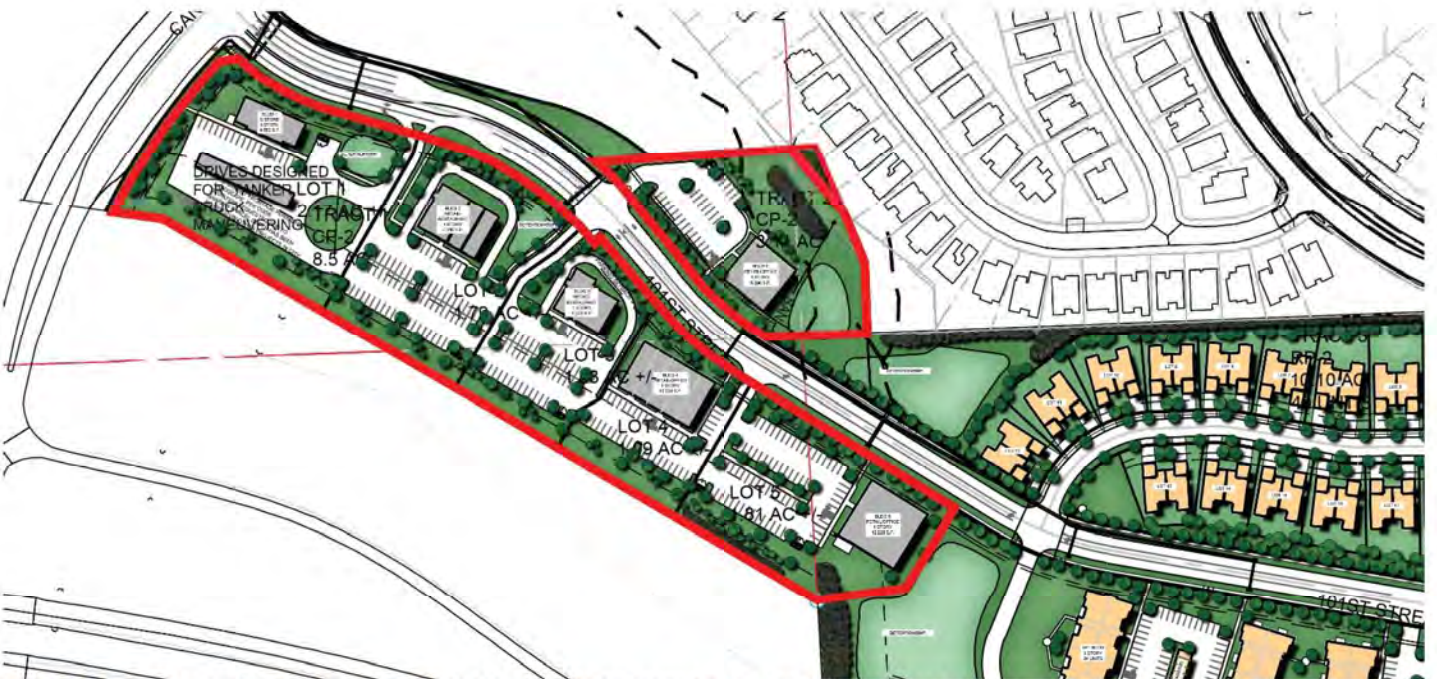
Approved Cedar Canyon West Concept Plan from February 2023. Subject site outlined in red.
